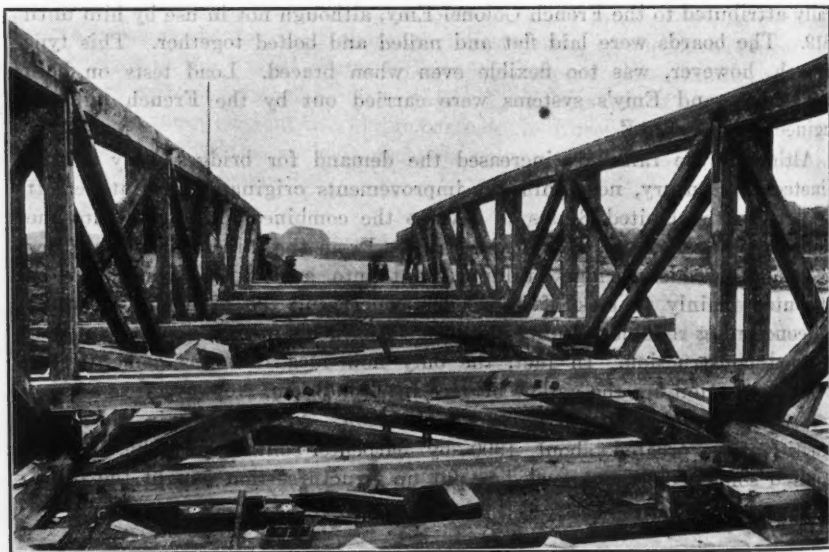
VIEW OF CONSTRUCTION BRIDGE OVER THE SPREE, BERLIN, GERMANY; CLOSE-UP OF ONE SPAN
